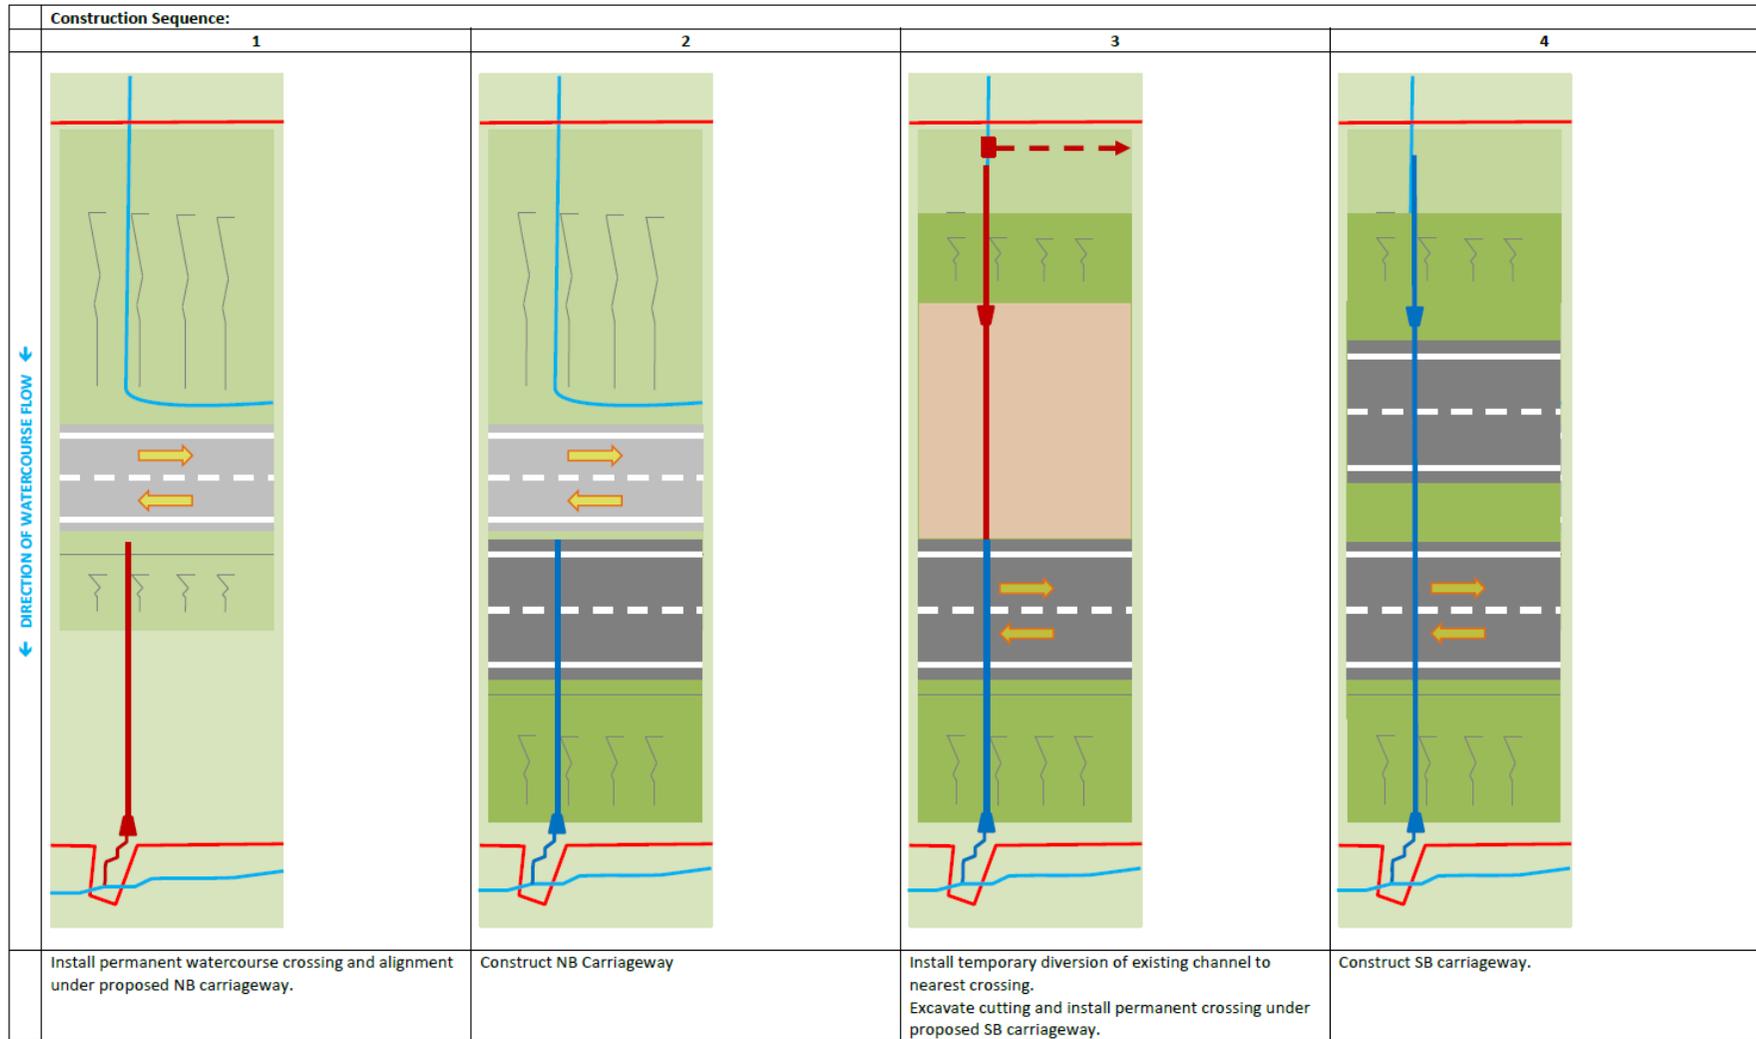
New watercourse crossing – widening to the east (road in cutting) and widening to the west (road in embankment)
